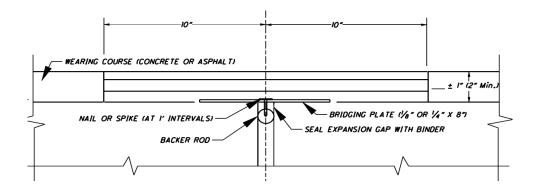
ODOT asphaltic plug joint detail (prestressed box beam bridge)
